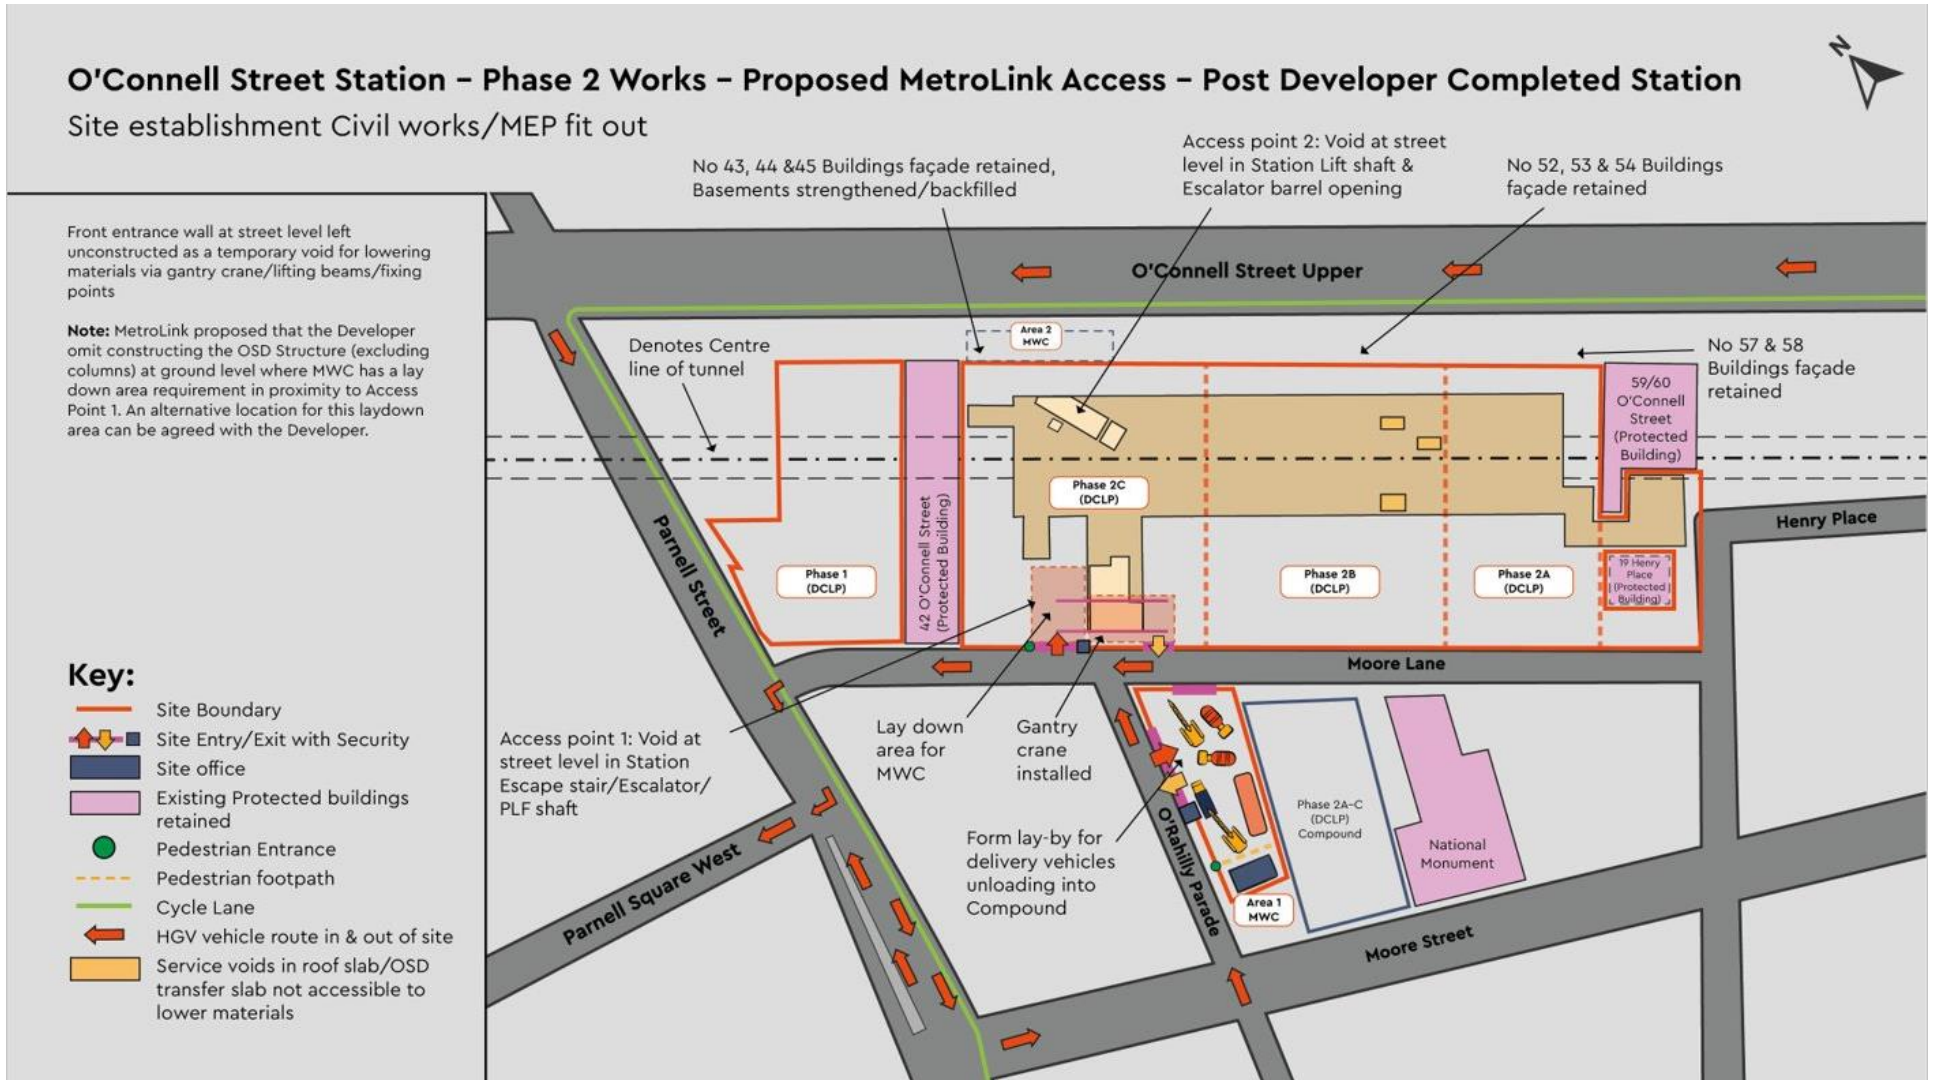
O'Connell Street – Site establishment Civil works/MEP fit out
